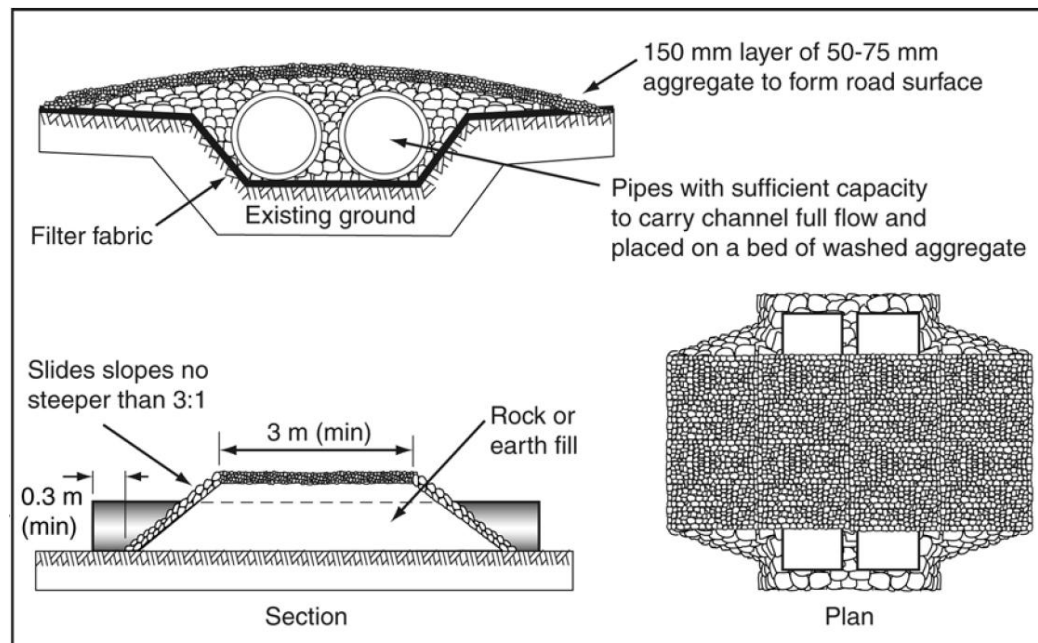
Typical waterway crossing configuration - culverts (IECA, 2008)
